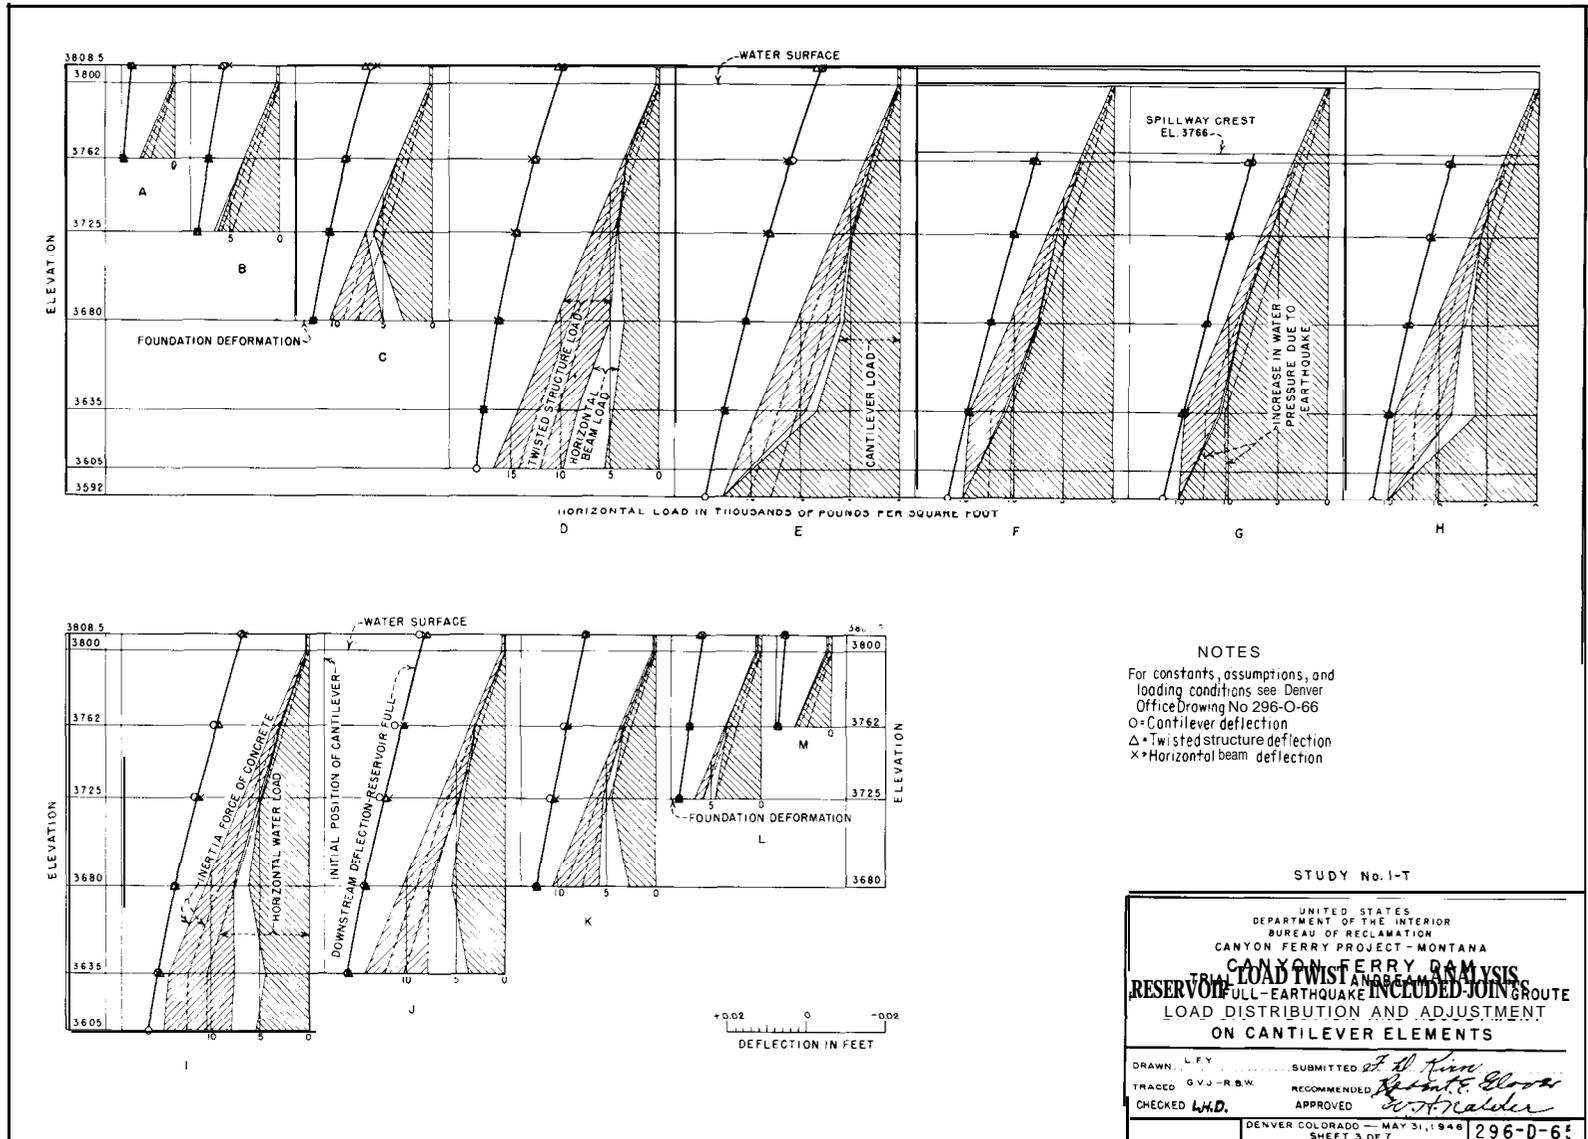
Canyon Ferry Dam study-load distribution and adjustment on cantilever elements.
